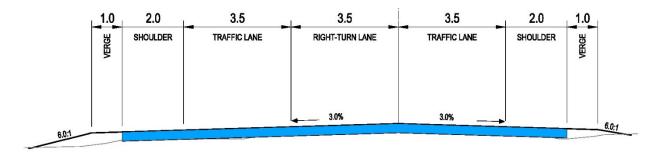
Typical cross section – Garfield Road West at Denmark Road
